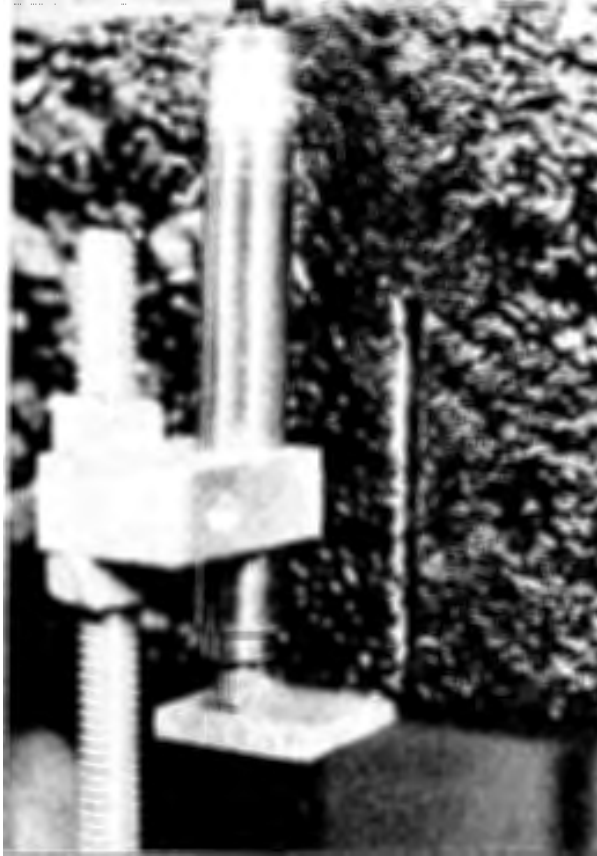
Photograph illustrating details of fracture beam deflection measuring technique.
